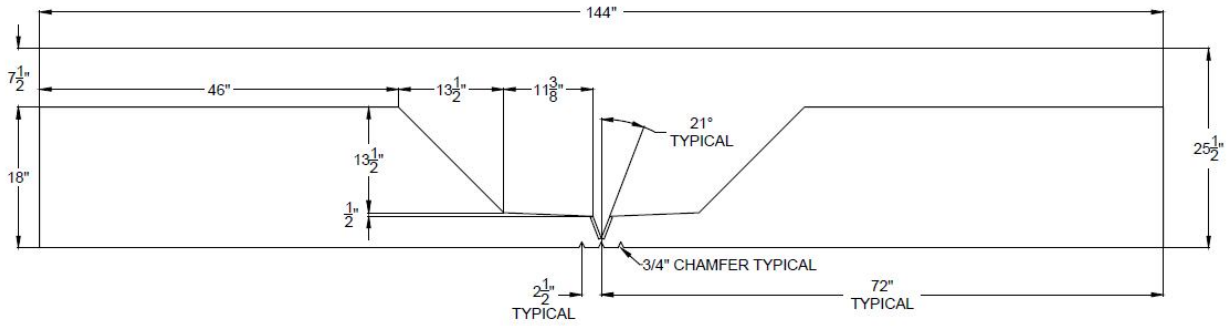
Cross-sectional geometry of Welded Connection Test Specimen
